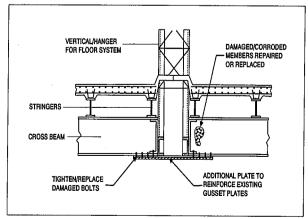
Section detail of Repair Works for Joints and Connection
